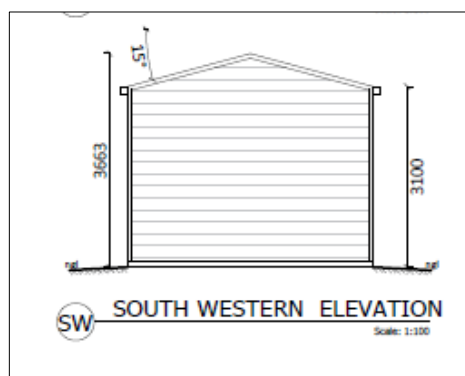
Elevation plan showing view of proposed garage from the residential zoned land
